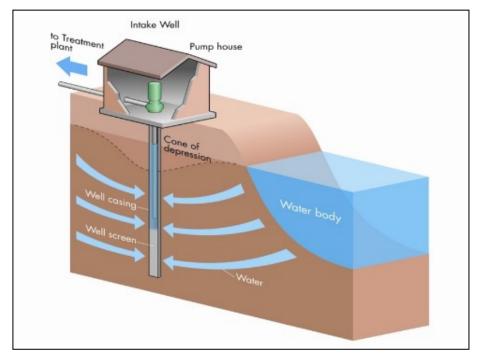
Schematic layout of a vertical beach well (Voutchkov, 2011).
